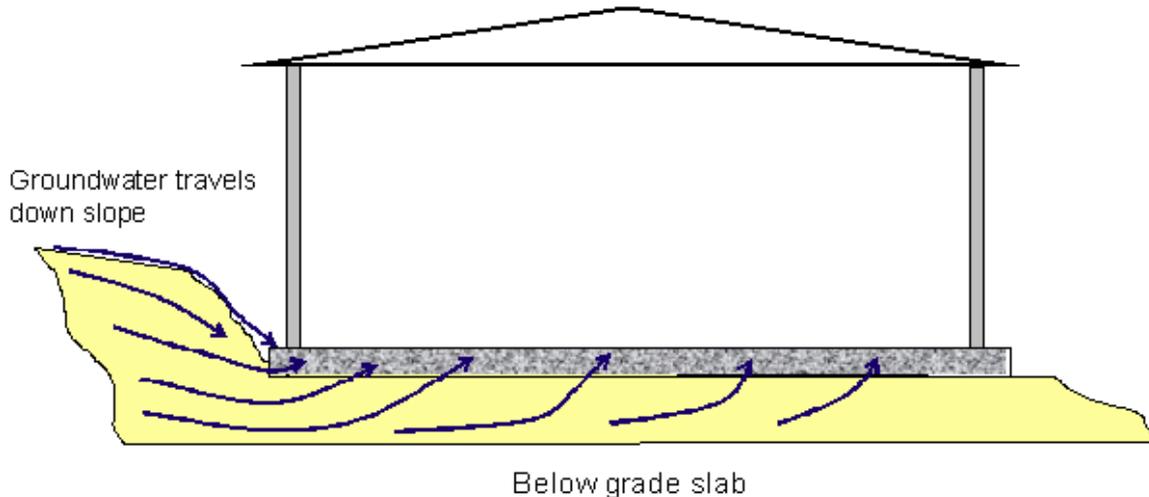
This schematic shows an example of a below-grade slab and how moisture can travel into the concrete. The picture below shows an example of a below-grade slab.
